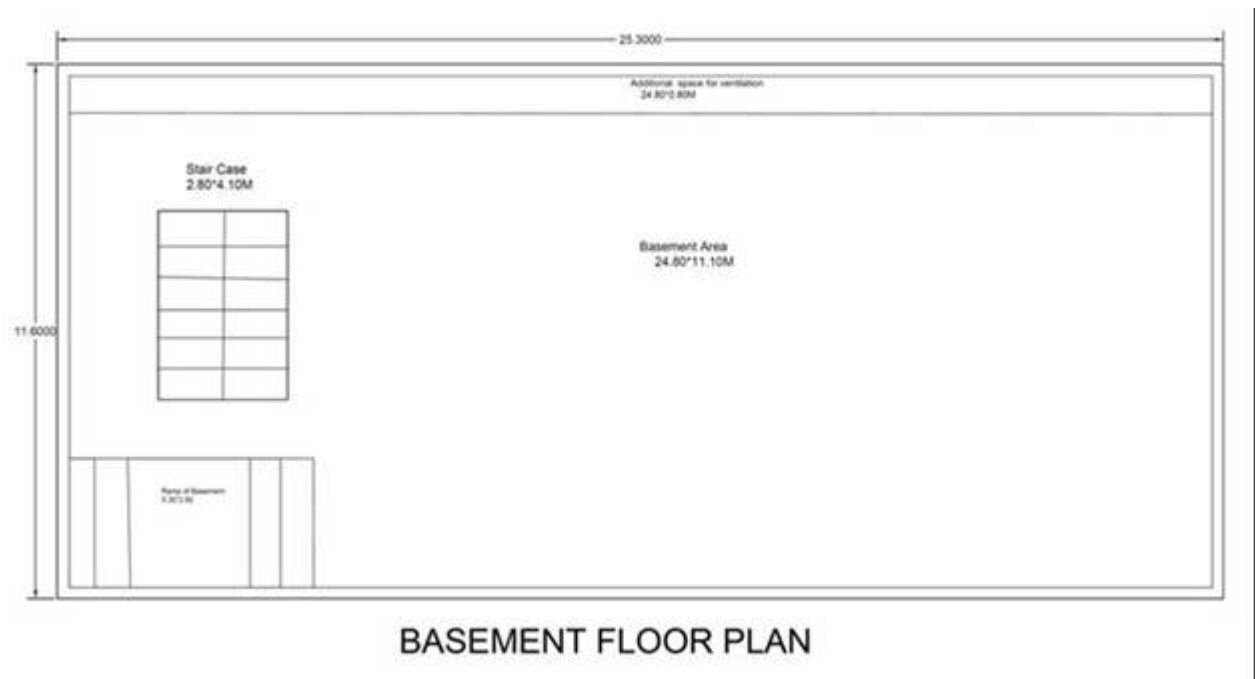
Parking Location: Basement Floor Plan, Rajpayga Multi Level Parking
